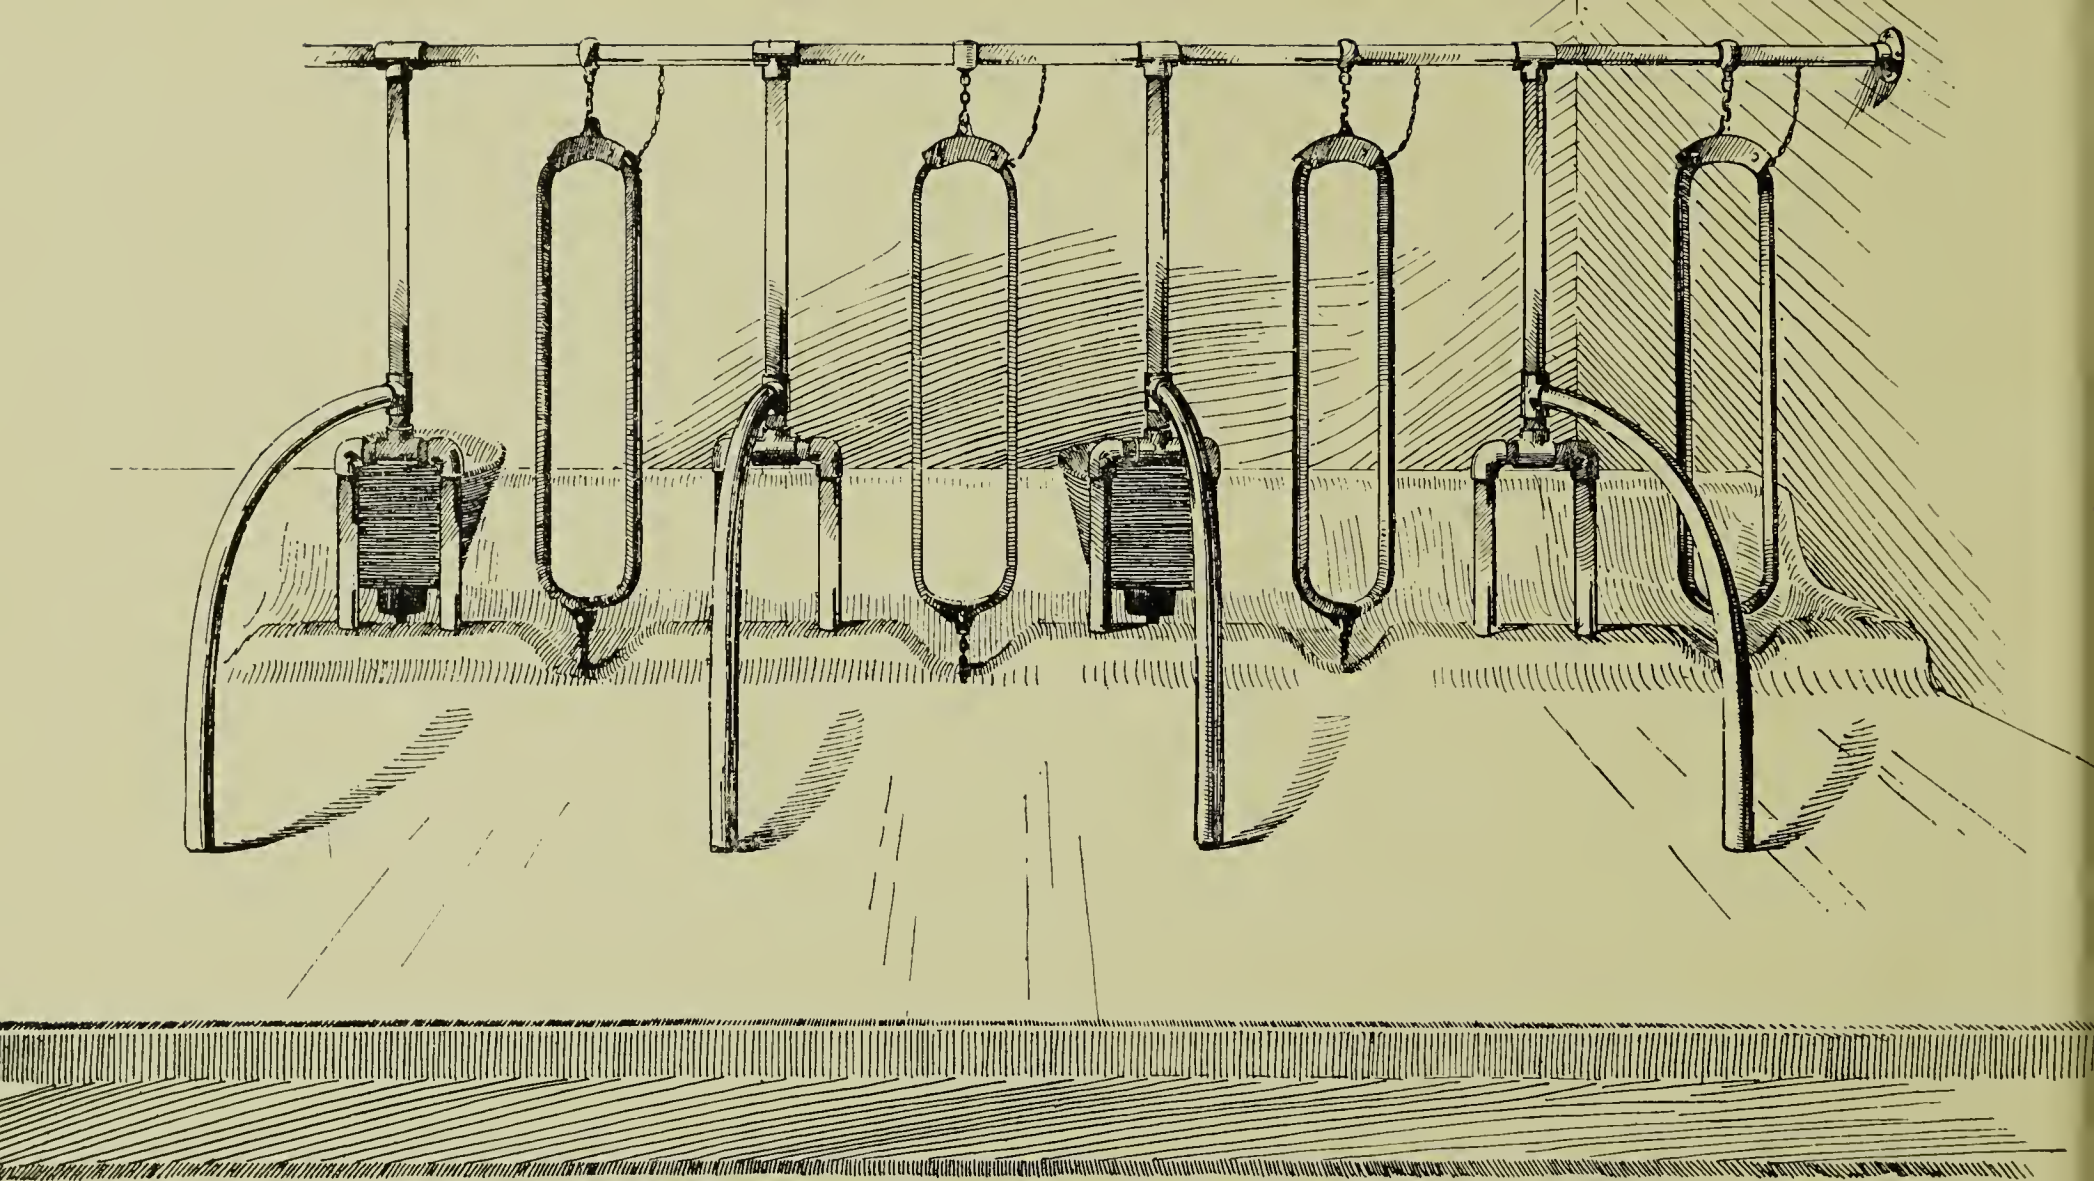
PLATE B—Cow Stall Framing similar to Plate A, except bottom of Posts, which are made double to give better footing in floor
